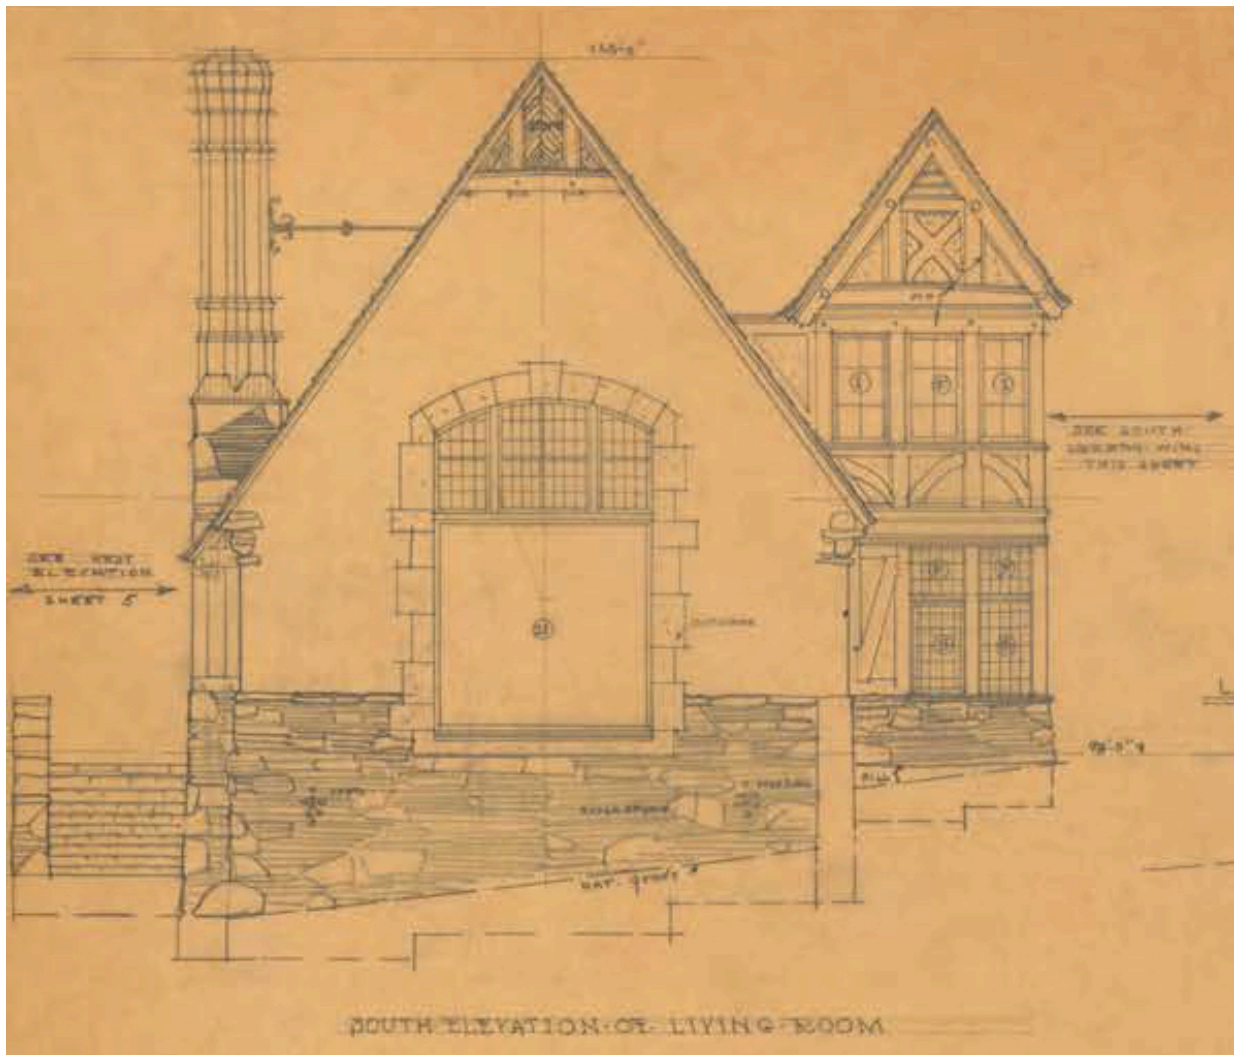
1929 South side elevation (courtesy The Bancroft Library)
